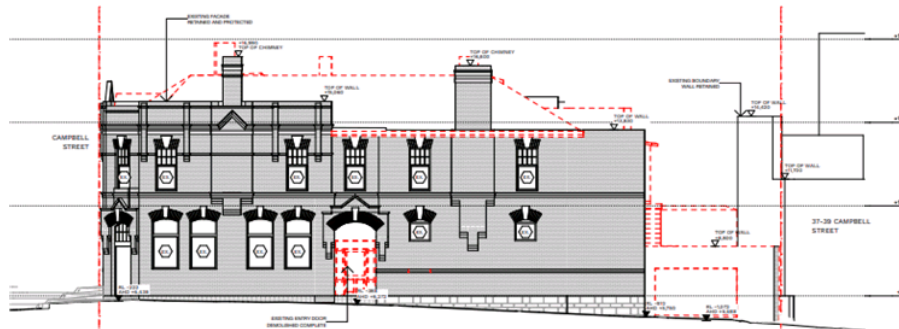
Proposed Demolition Sackville Street elevation (Source: Cumulus)
